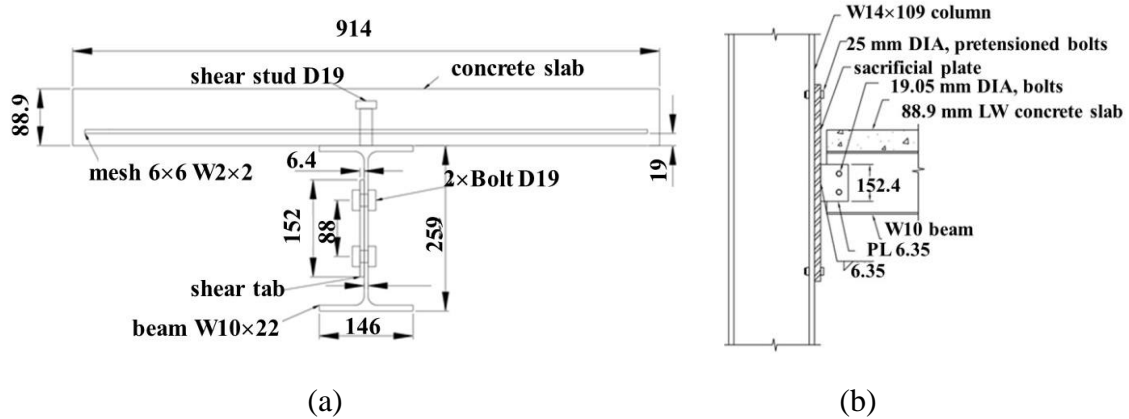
Details of the specimen (a) dimensions of the cross-section (b) connection details. [11]
